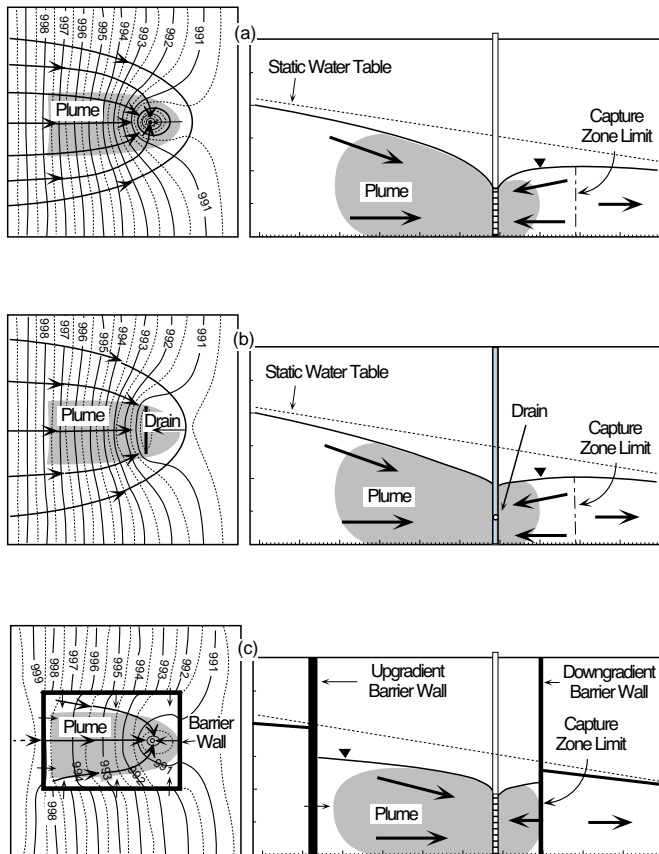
Examples of hydraulic containment in plan view and cross section using an extraction well (a), a drain (b), and a well within a barrier wall (c).
